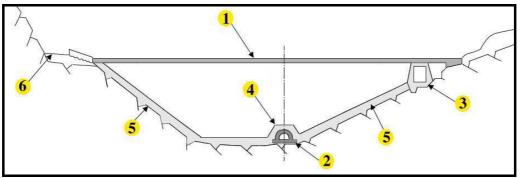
Longitudinal section through the Surduc Dam 1. coping of the weir 2. Bottom outlet 3. Side overfall 4. Transversal drain 5. longitudinal drain 6. Rounding way of the lake
